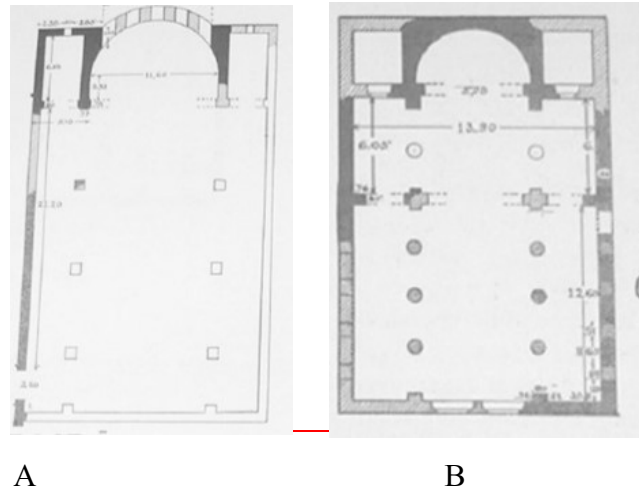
Bosra Church plan with curved apse, Second Church plan of Bosra, (*Butler, 1929, p. 119*)
